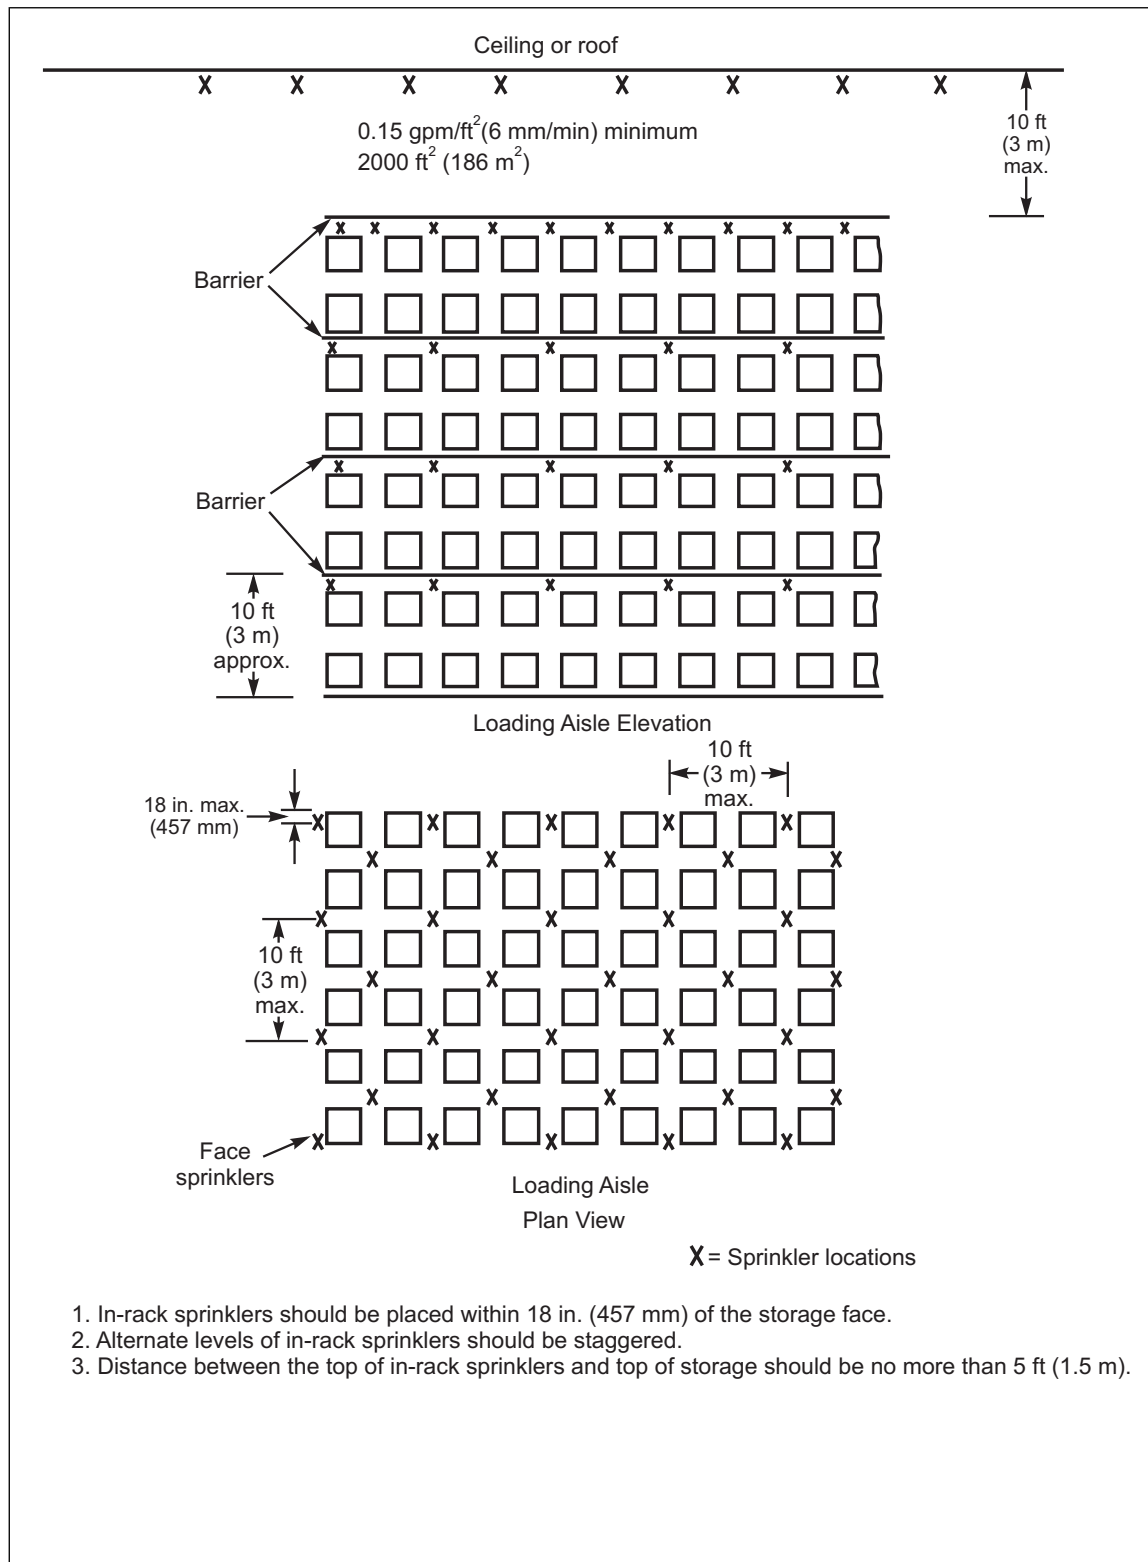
Multiple-row racks of any height; protection using horizontal barriers and in-rack sprinklers
